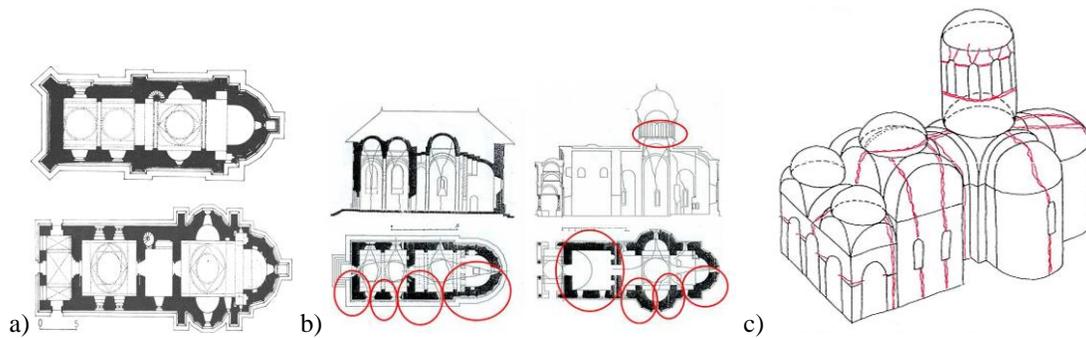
a) typical plans of Romanian orthodox churches; b) damage of Borzesti and Cozia churches due to 1977 Vrancea earthquake; c) failure blocks of Romanian orthodox churches [5.16]
